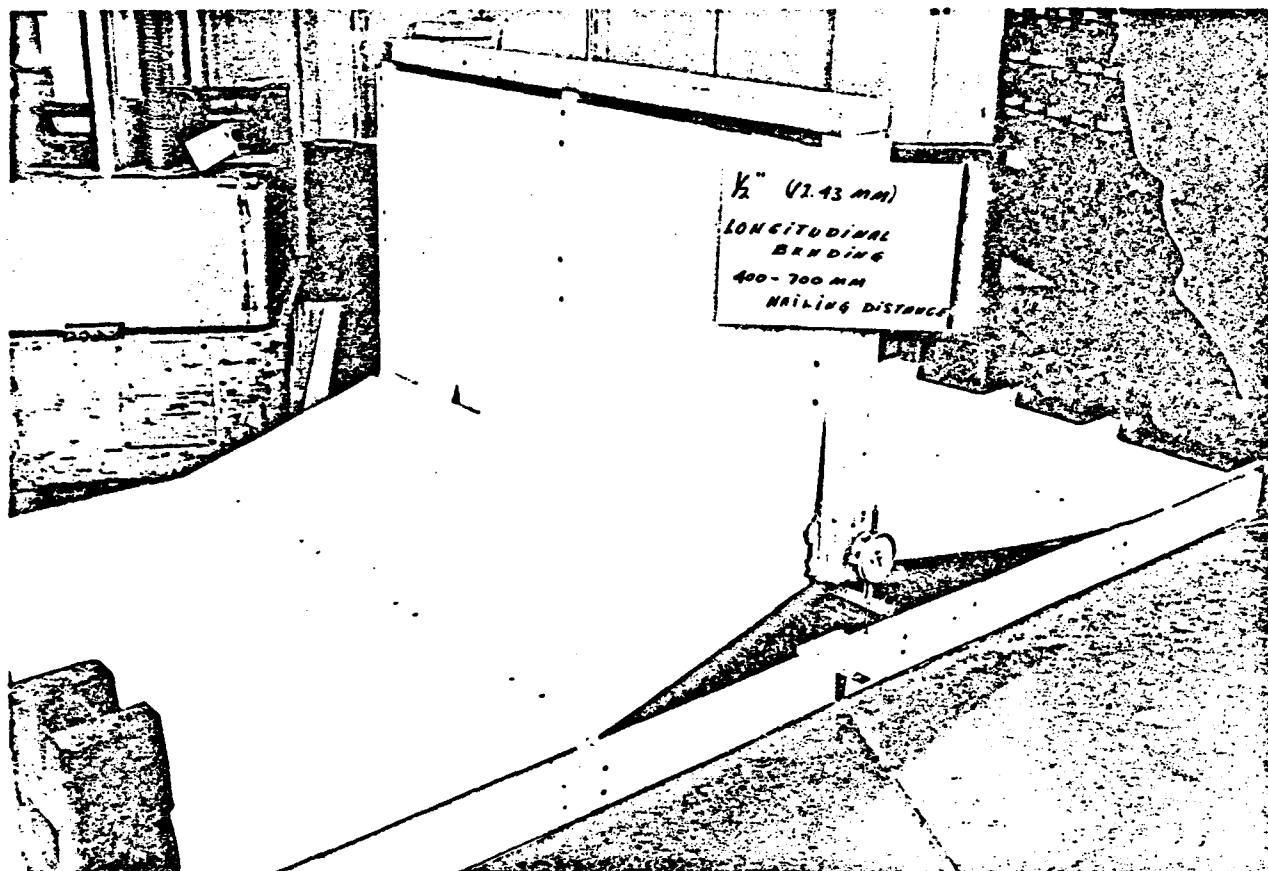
Photo of a Full-Sized T Specimen Made With 1/2-inch Gypsum Board Simulating a Partition Parallel to the Roof Trusses After Failure of the 400 mm Cantilever.
